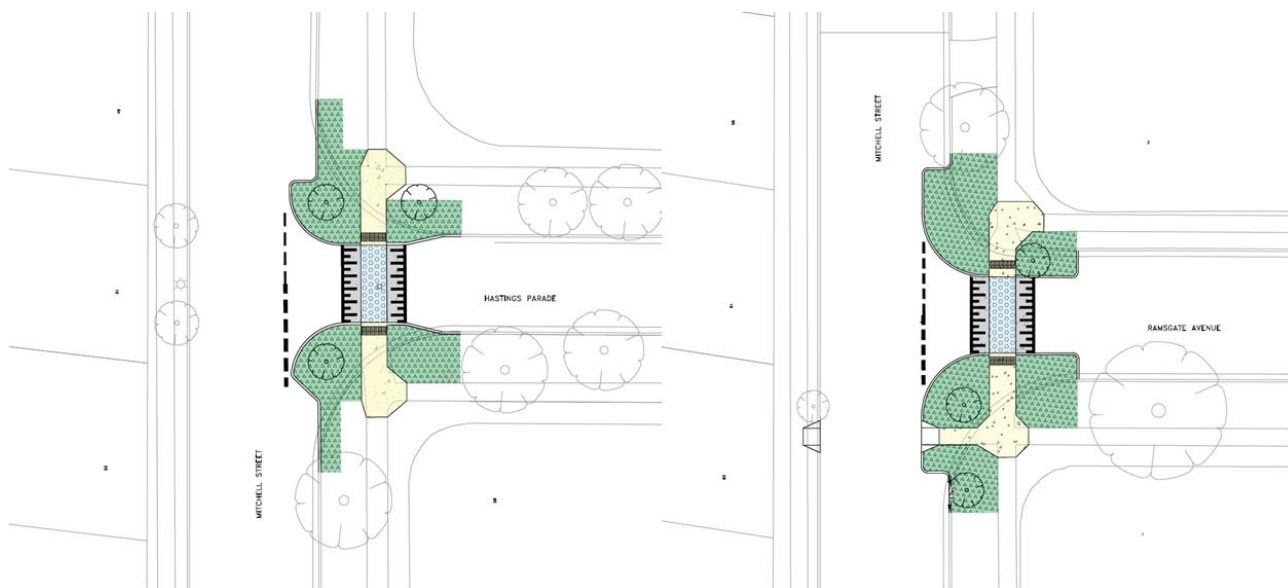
Continuous footpath treatments in Mitchell Street, North Bondi, at Hastings Parade and at Ramsgate Avenue.
